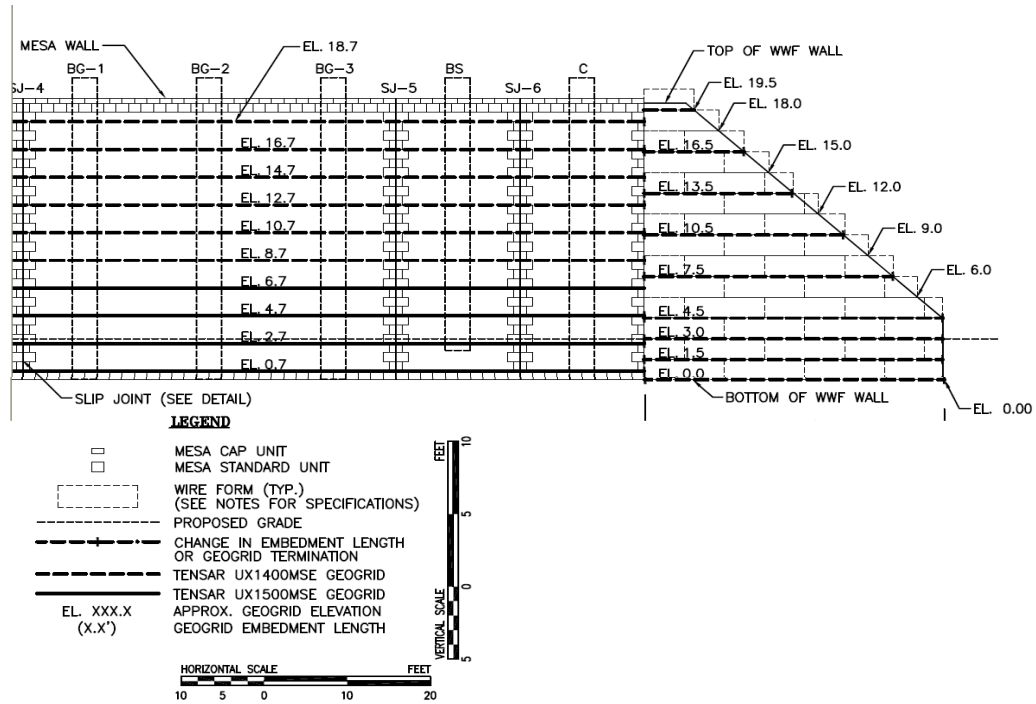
Wall and Drill Shaft Layout (Tensar, 2007)
